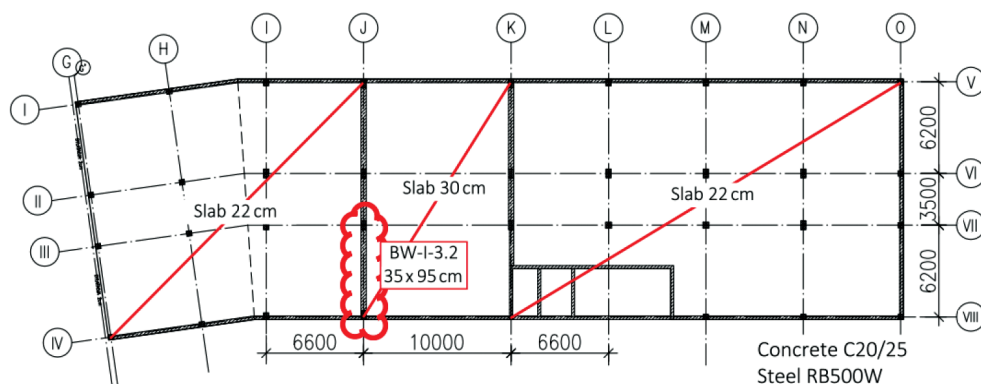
The considered Floor Plan (defective beam marked)
